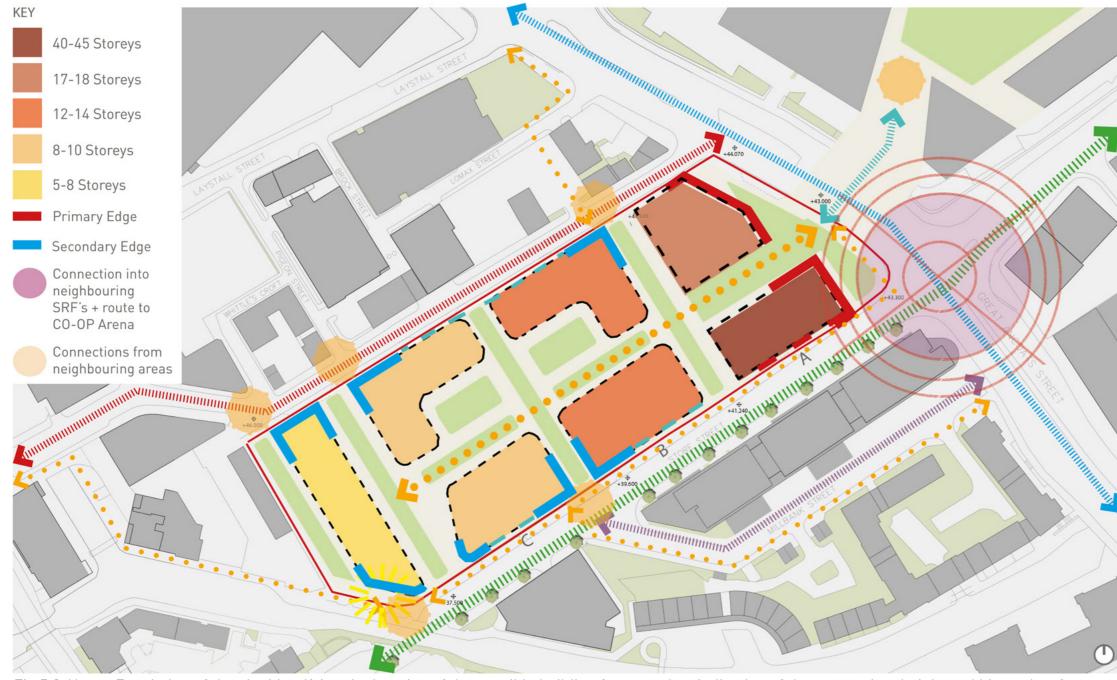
Above: Zonal plan of the site identifying the location of the possible building forms and an indication of the appropriate height and hierarchy of street edges
